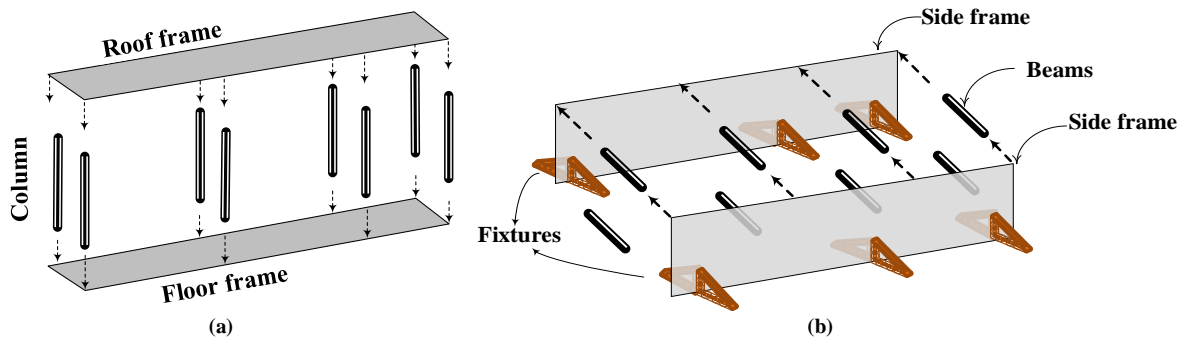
Module assembly method: (a) vertical assembly, (b) parallel assembly.
